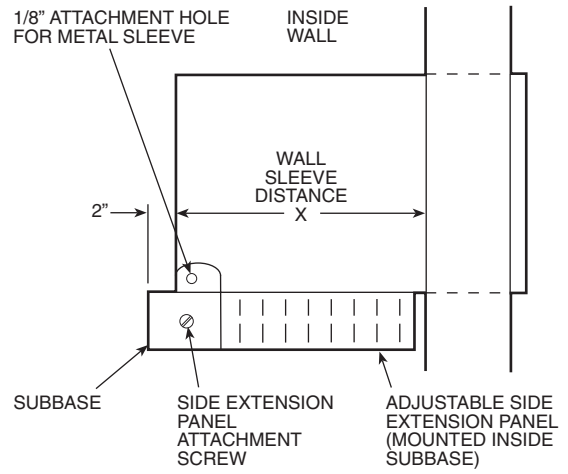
Attaching Adjustable Side Extensions to Subbase
